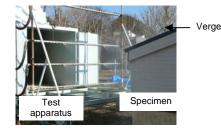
State of Specimens and Testing of Strong Rainfall Testing
